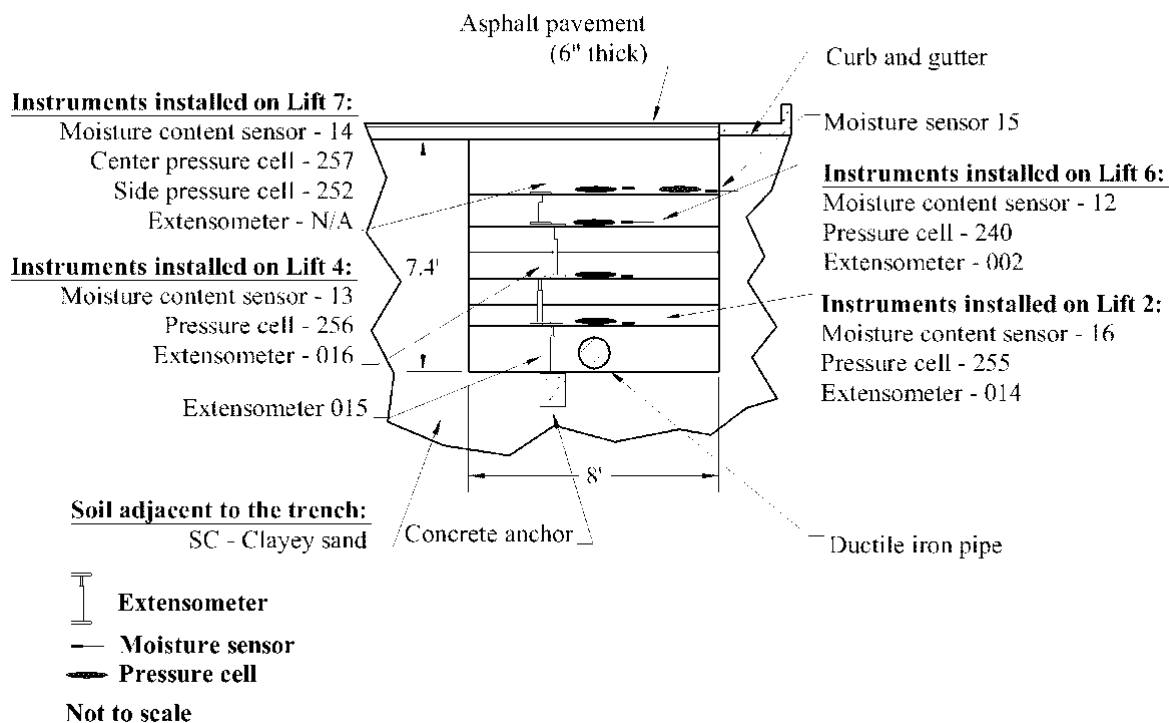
Cross-section of Trench BI showing the locations of the instrumentation
